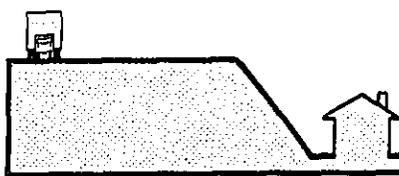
Shielding by an Elevated Highway or Railway.
